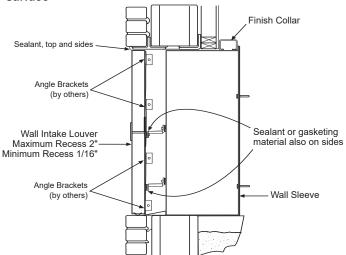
This shows a typical panel wall installation where the panel wall thickness is greater than that of the louver. In this case, it is possible to mount the louver without flange using angle brackets. The louver could be removable from the exterior of the building.
